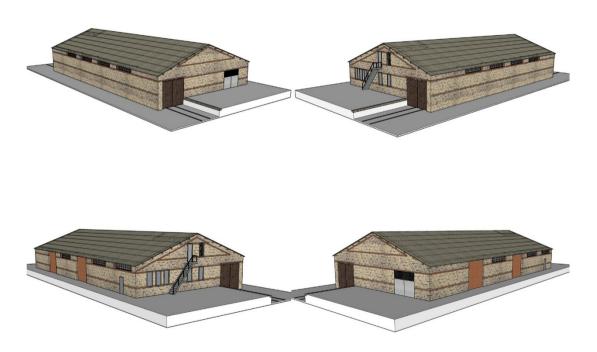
3D views of Warehouse Building (Sinan, 2019)
